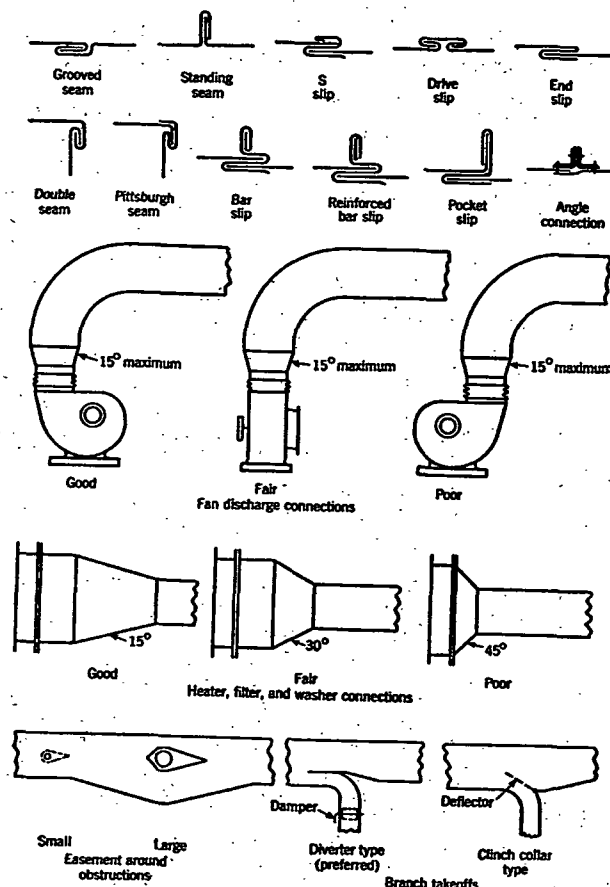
SHEET METAL DUCT AND ARRANGEMENT DETAILS
